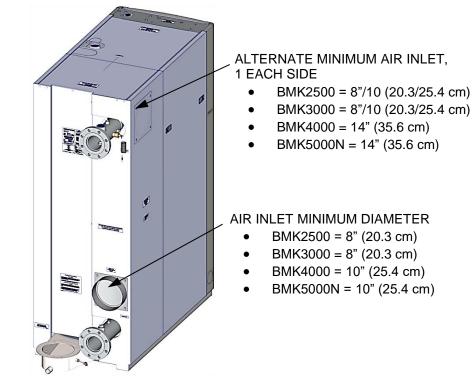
Ducted Combustion Connection for BMK2500, BMK3000, BMK4000 & BMK5000N Boilers
